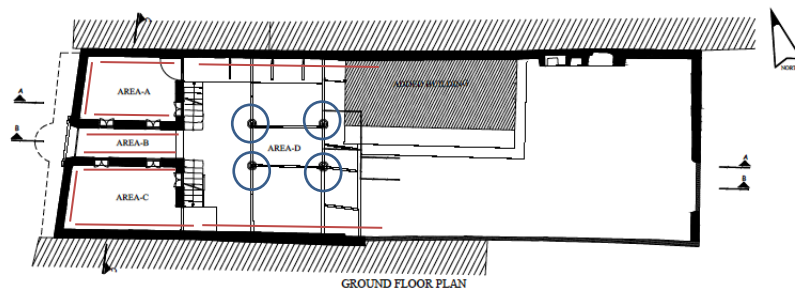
Adana-Tepebağ case study house ground floor plan [1].
